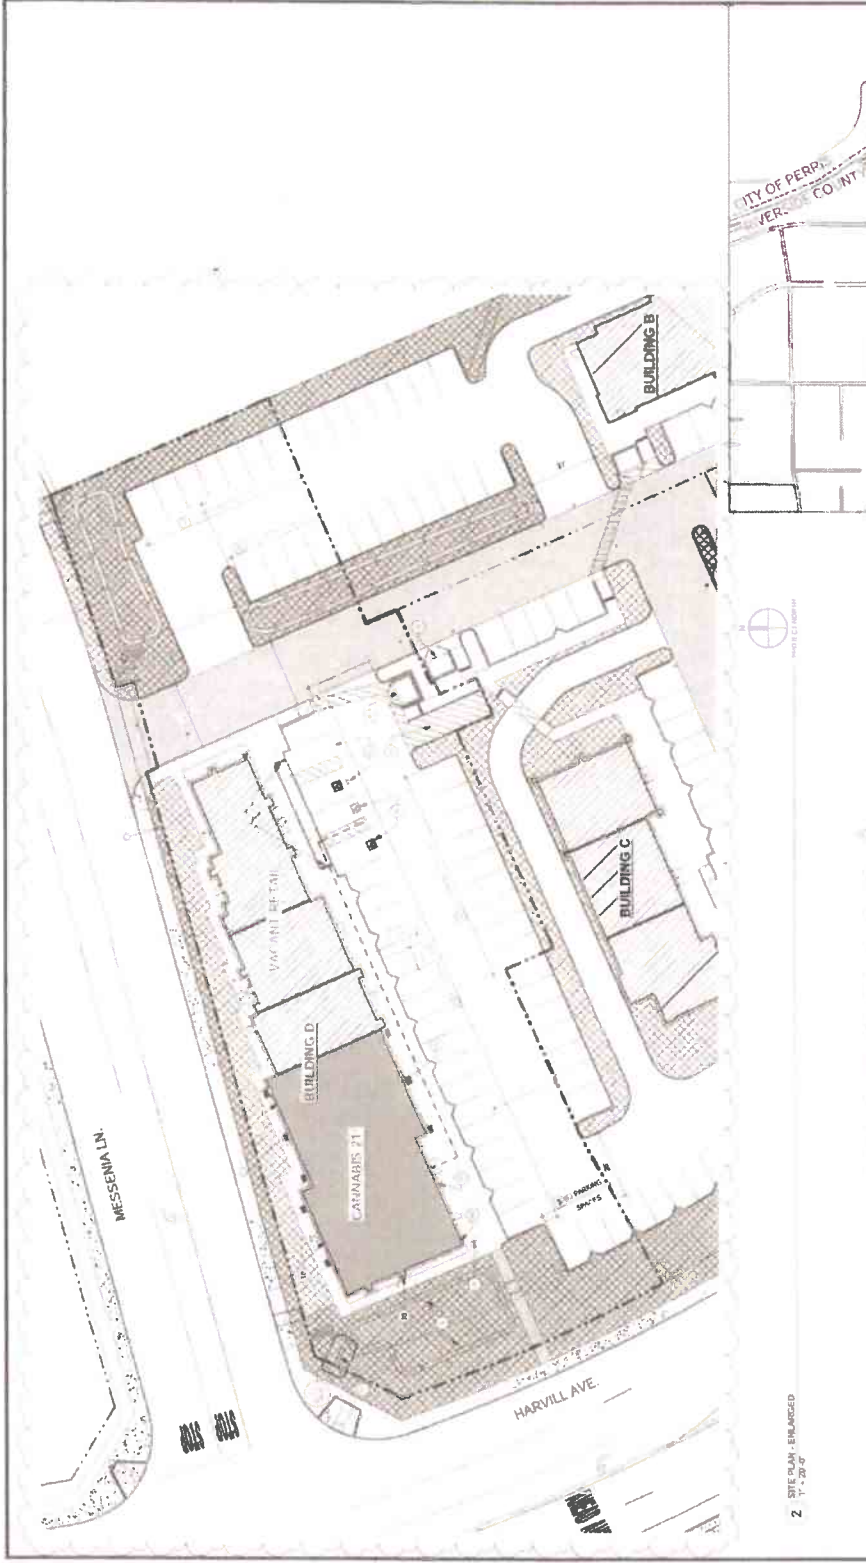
EXHIBIT A: ENLARGED SITE PLAN & SENSITIVE USE PLAN
